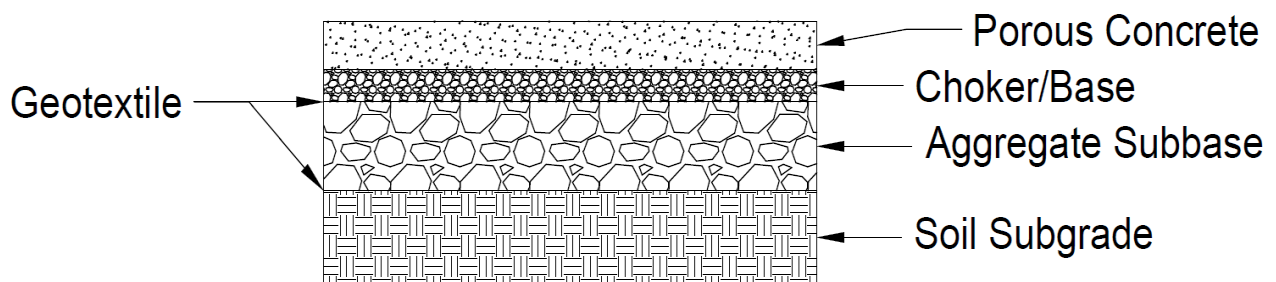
Typical cross section of a Porous Concrete system (not to scale).
